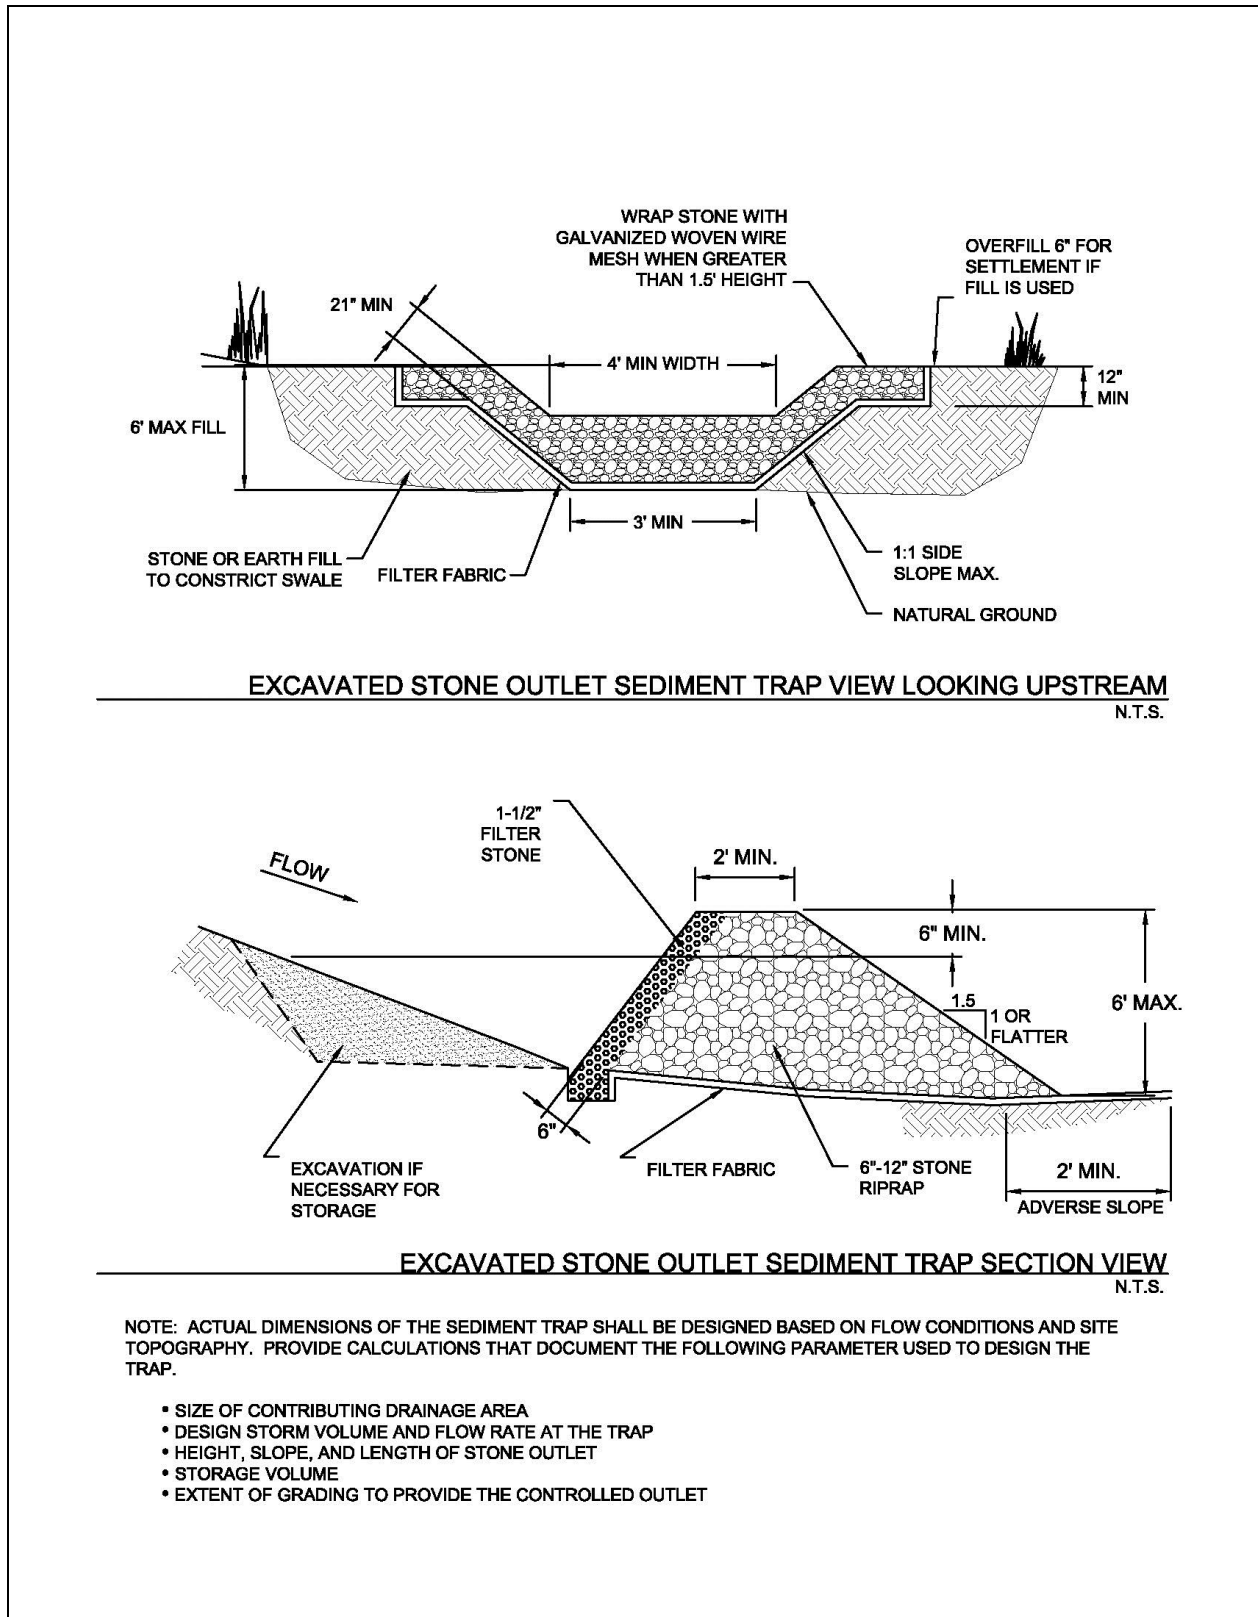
Schematics of Excavated Stone Outlet Sediment Trap
